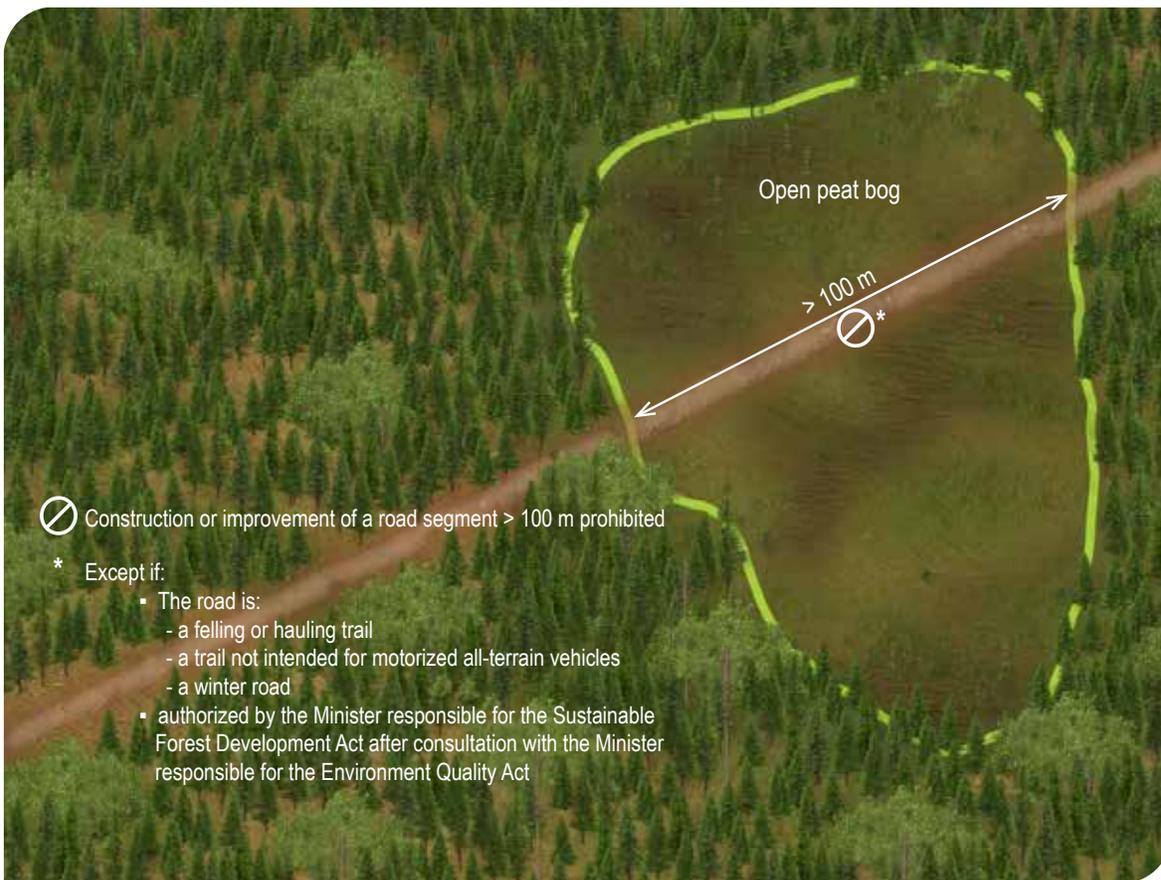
Rules governing the construction or improvement of a road located in an open peat bog
